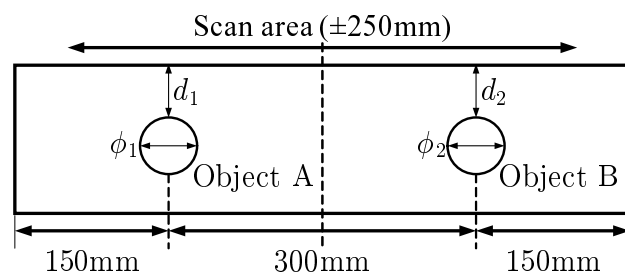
Cross-section and dimensions of concrete test specimen No.1~4.
